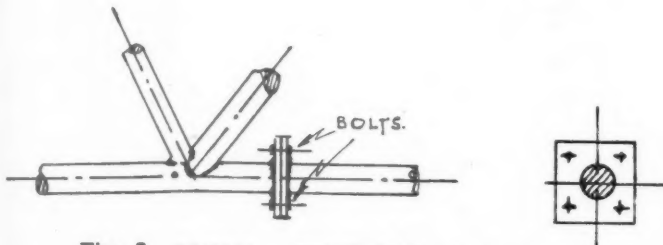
DETAIL. JOINT FOR SMALL SPANS.
